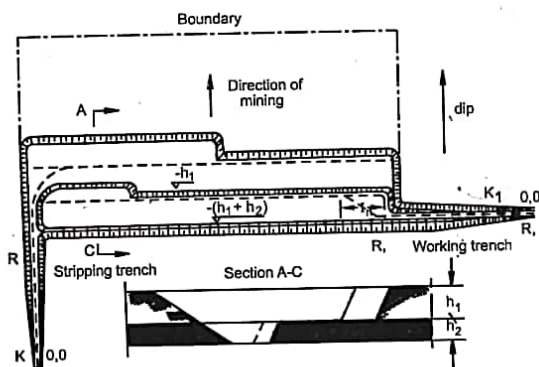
Layout of a mechanised quarry with separate trenches
